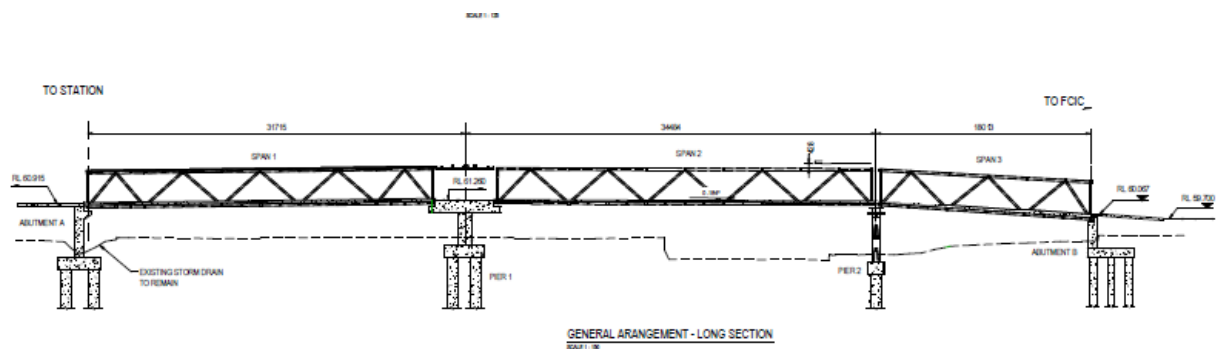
Elevated Walkway Arrangement – Elevation
